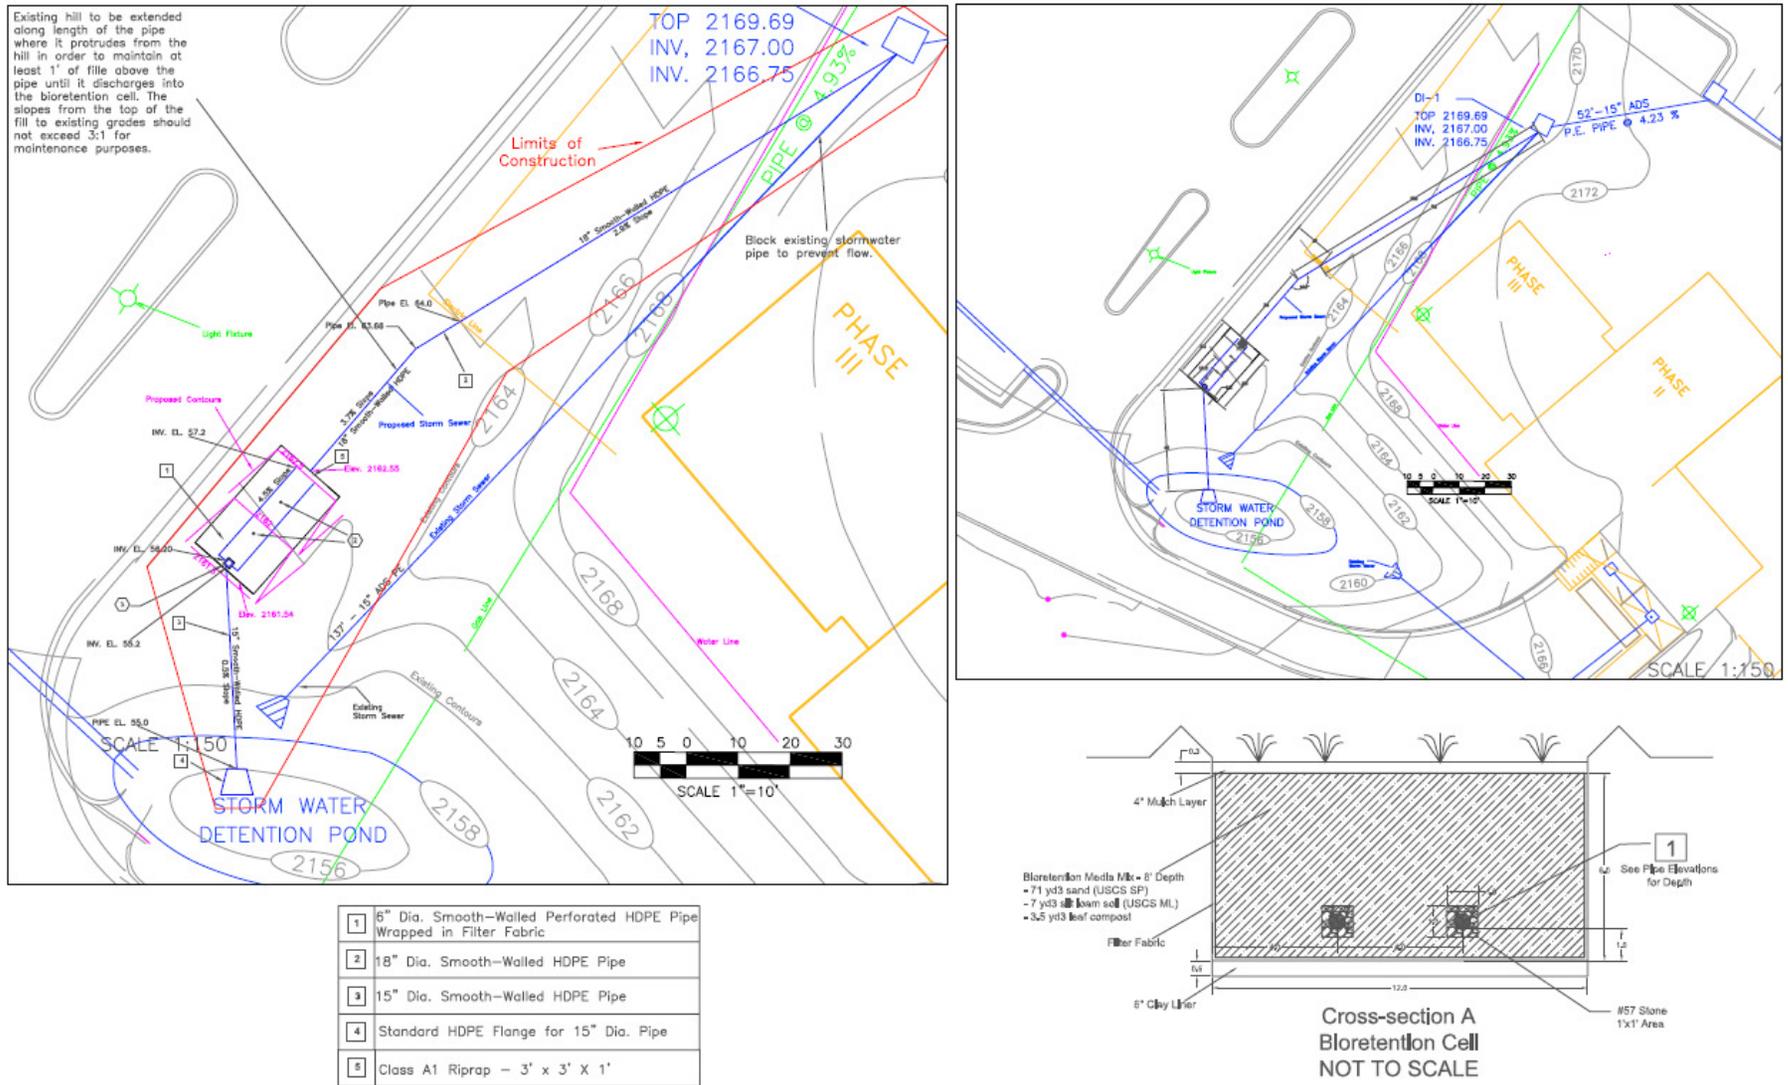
Construction plans for the bioretention cell. Drawings not to scale.
